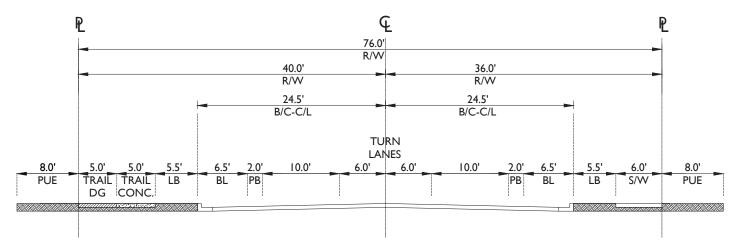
COLLECTOR STREET WITH TRAIL - 76' ROW
